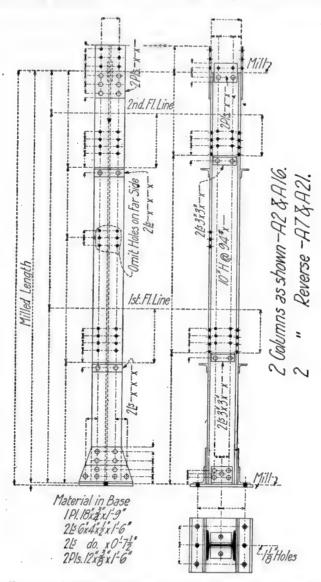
STANDARD DETAILS FOR BETHLEHEM H-COLUMNS.
